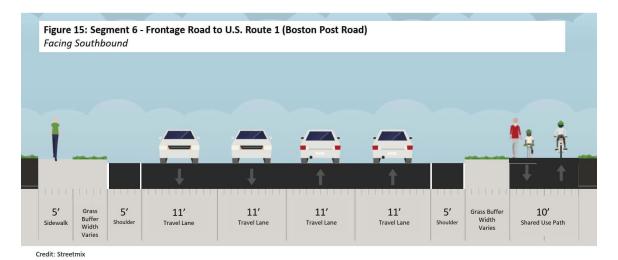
and 16 show the improvements developed for the Route 161 corridor segment between Frontage Road and U.S. Route 1 (Boston Post Road). The improvements include:
